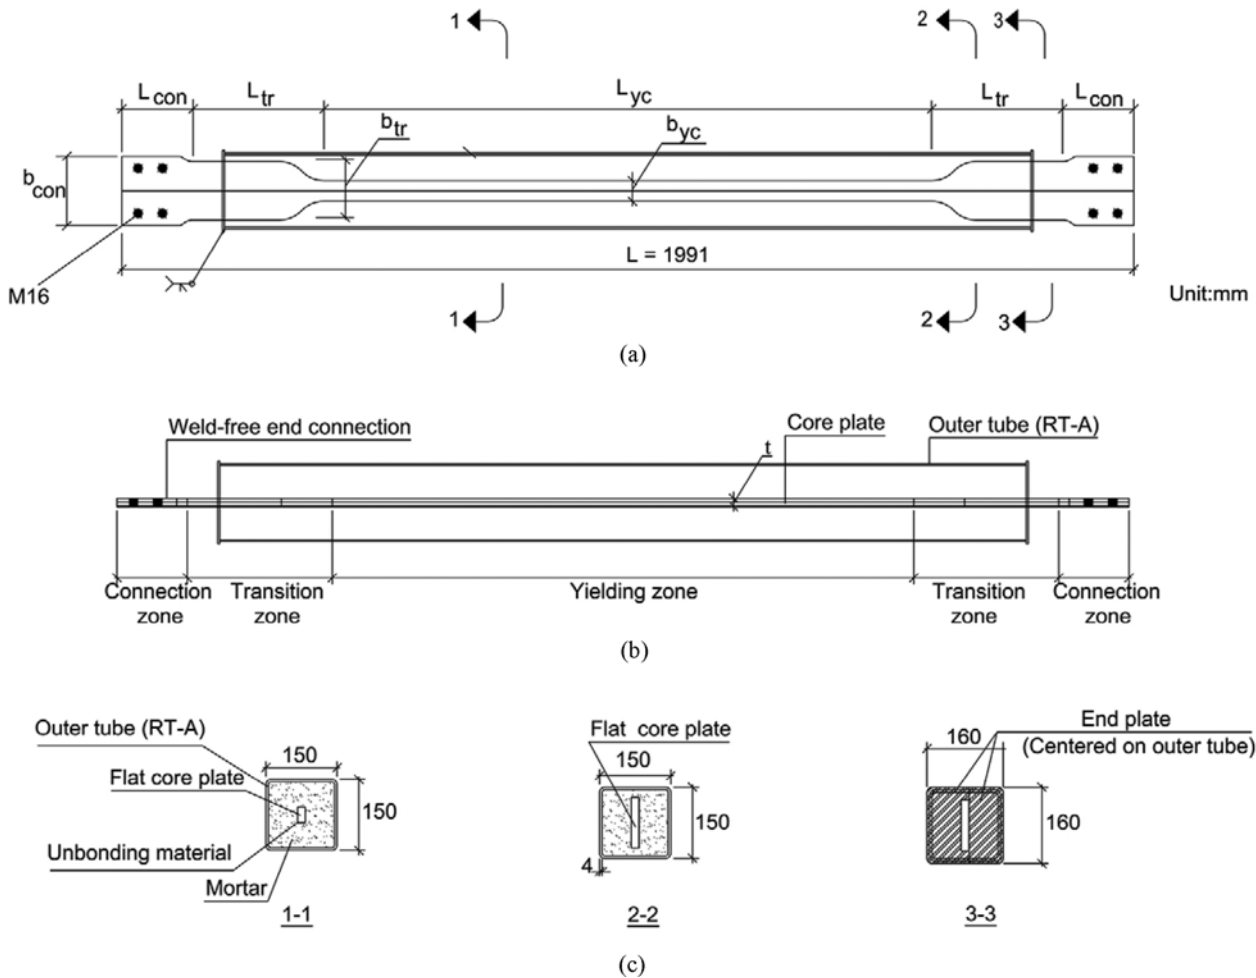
BRB Configurations for Multi-bolted (Weld-Free) End Connection BRB (BRB-AC3): (a) Front View, (b) Top View, (c) Cross-sections
